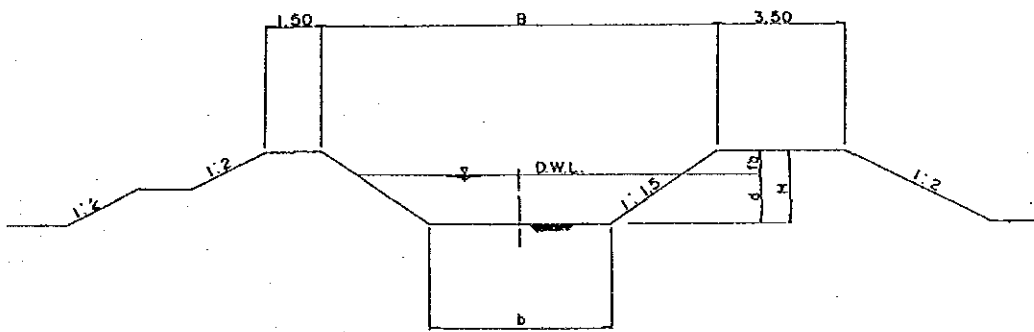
Typical Cross Section of Proposed Secondary and Sub-secondary Canals
